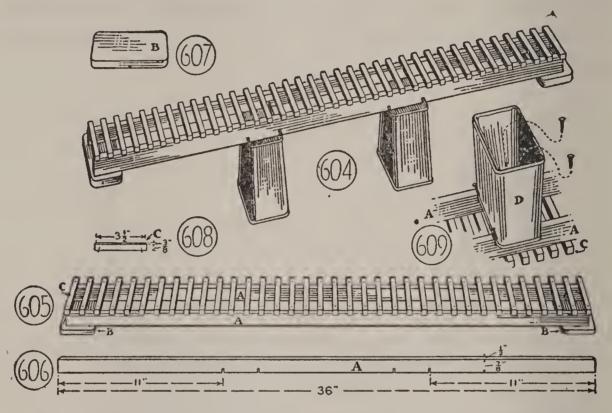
Box Girder Type of Bridge Used in Model in Photograph of Fig. 598.
